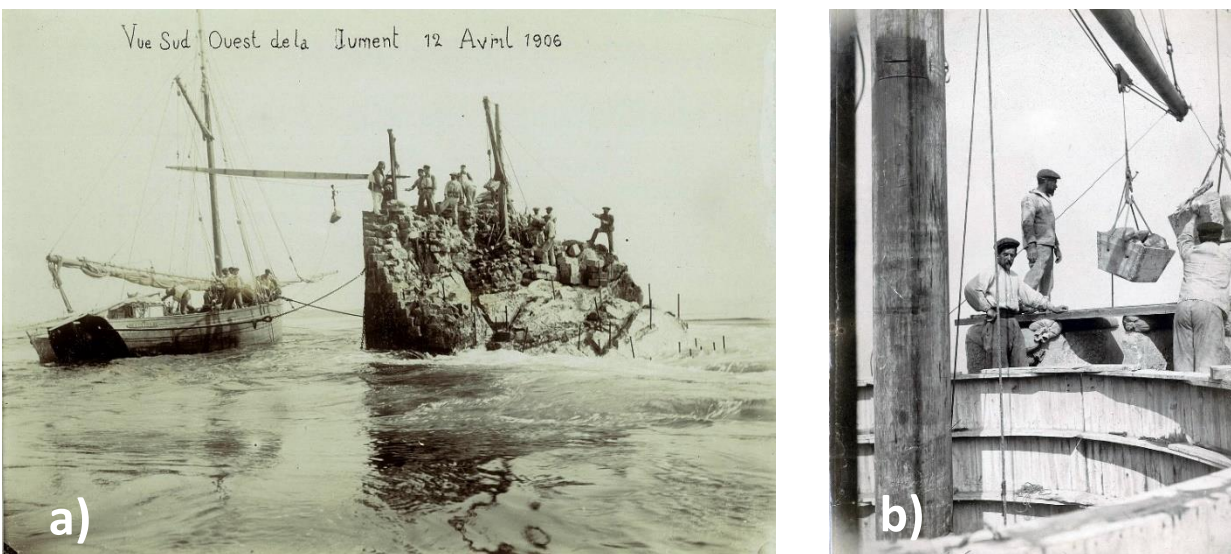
a) Base construction, South-west view April 1906; b) Masonry and mortar [Loïc Malgor]
